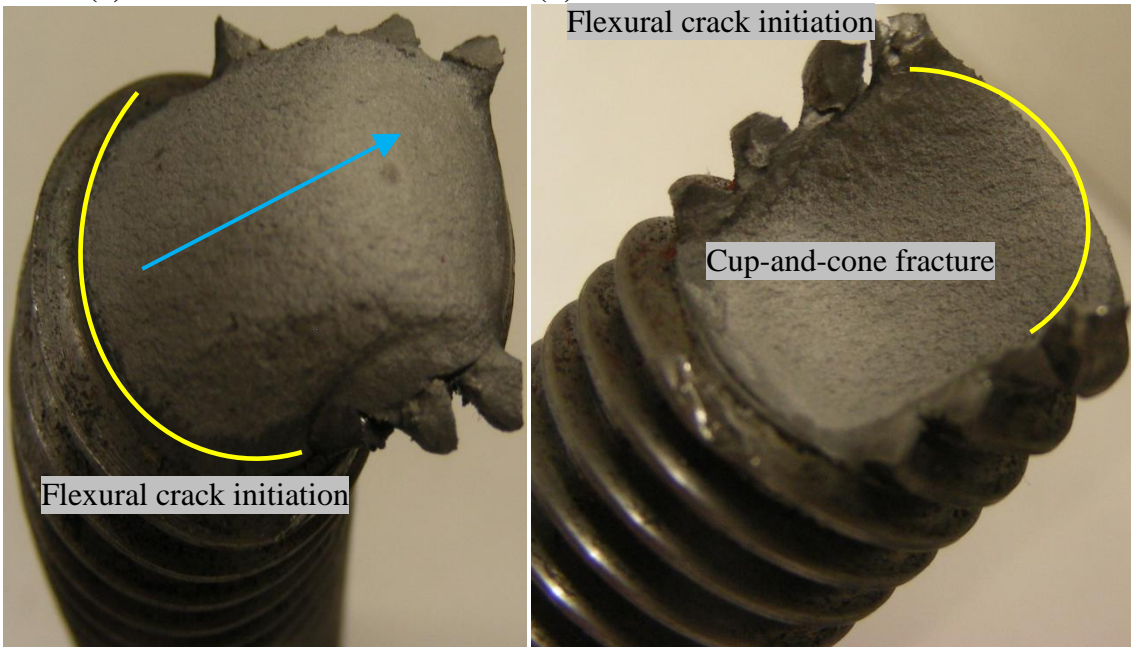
fracture surfaces of A307-da- RL
